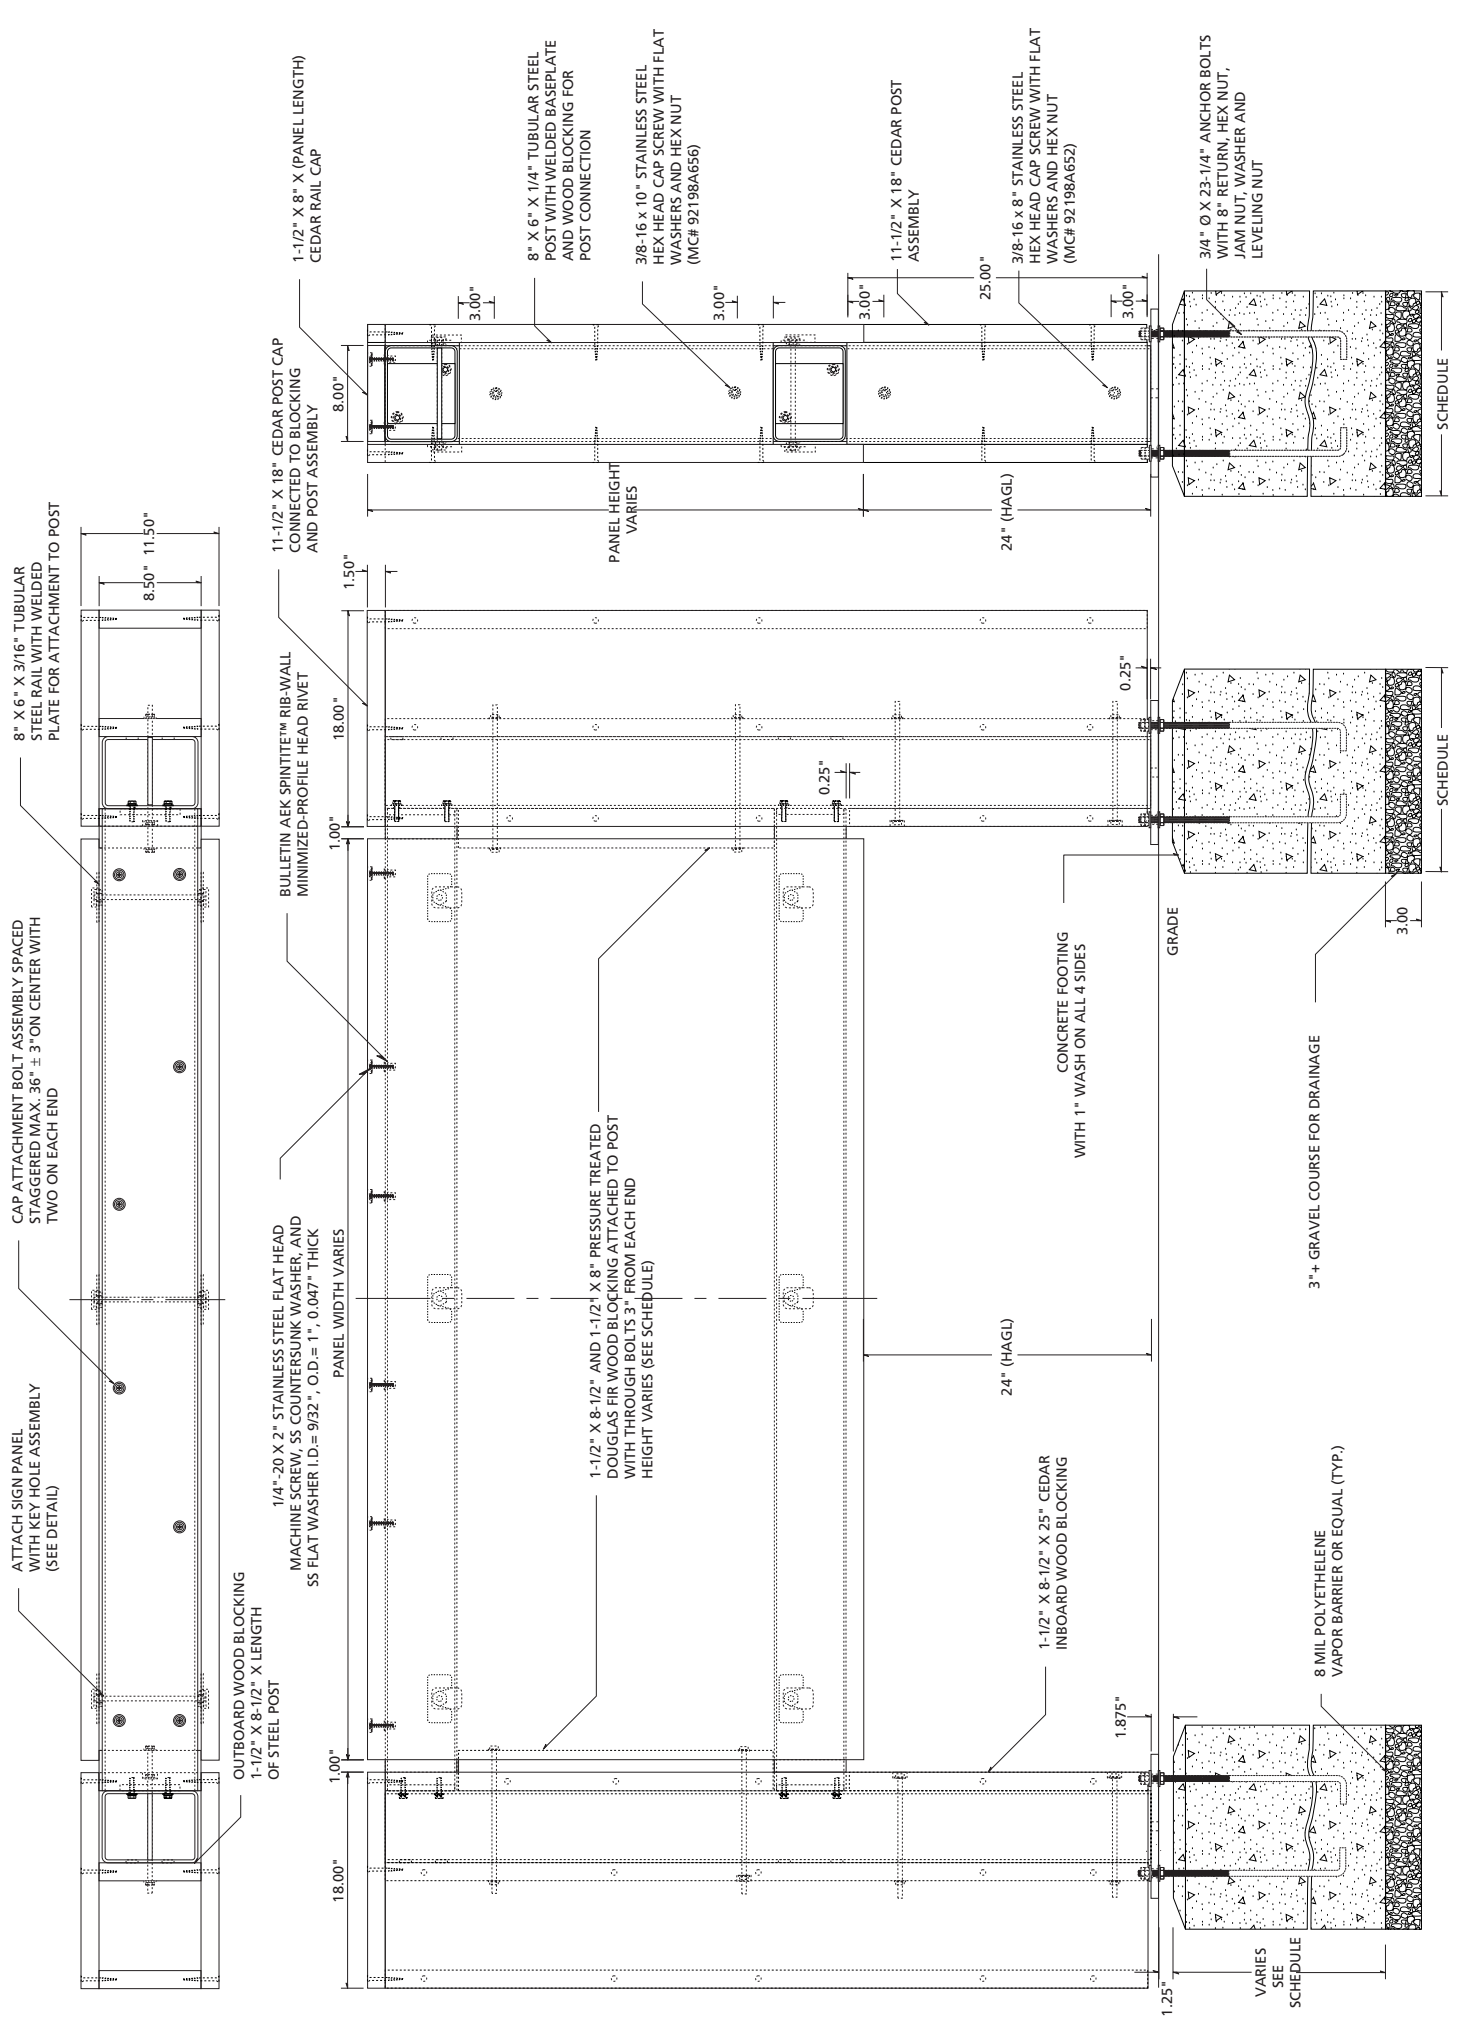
DETAIL E. UPPER WOOD RAIL ASSEMBLY FRONT ELEVATION
